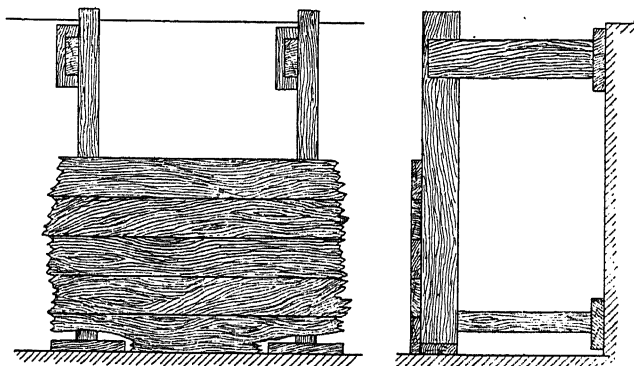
Method of Building Framework for Construction of Concrete Foundation.
